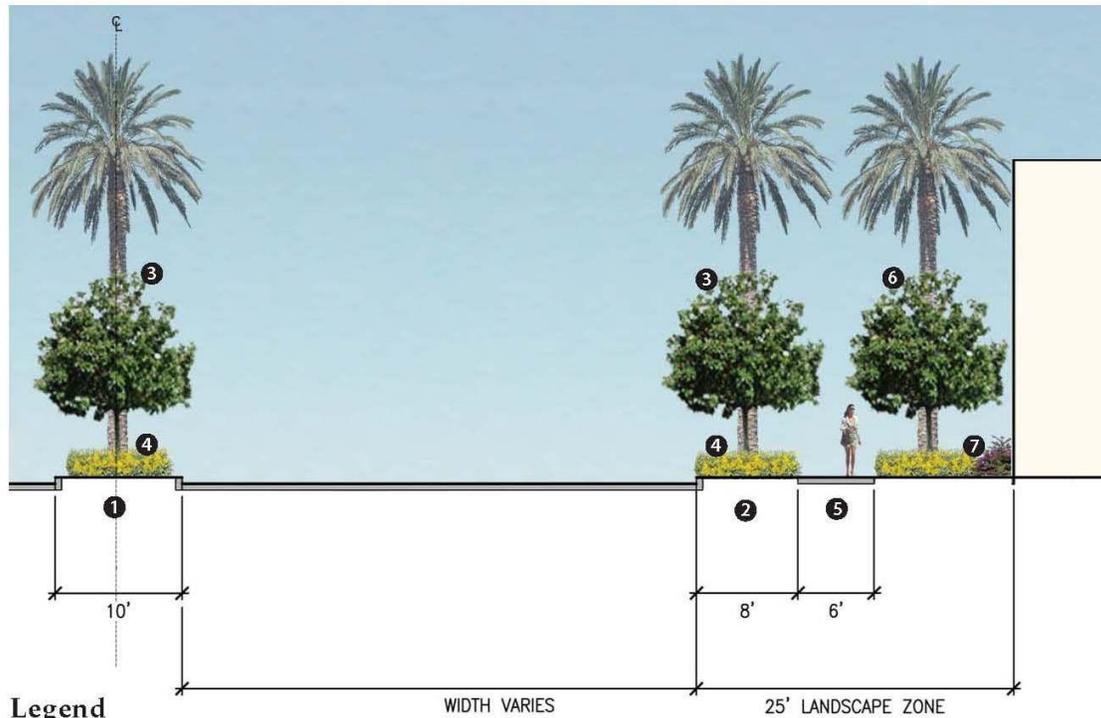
Murrieta Hot Springs Road Setback at Parking Lot
